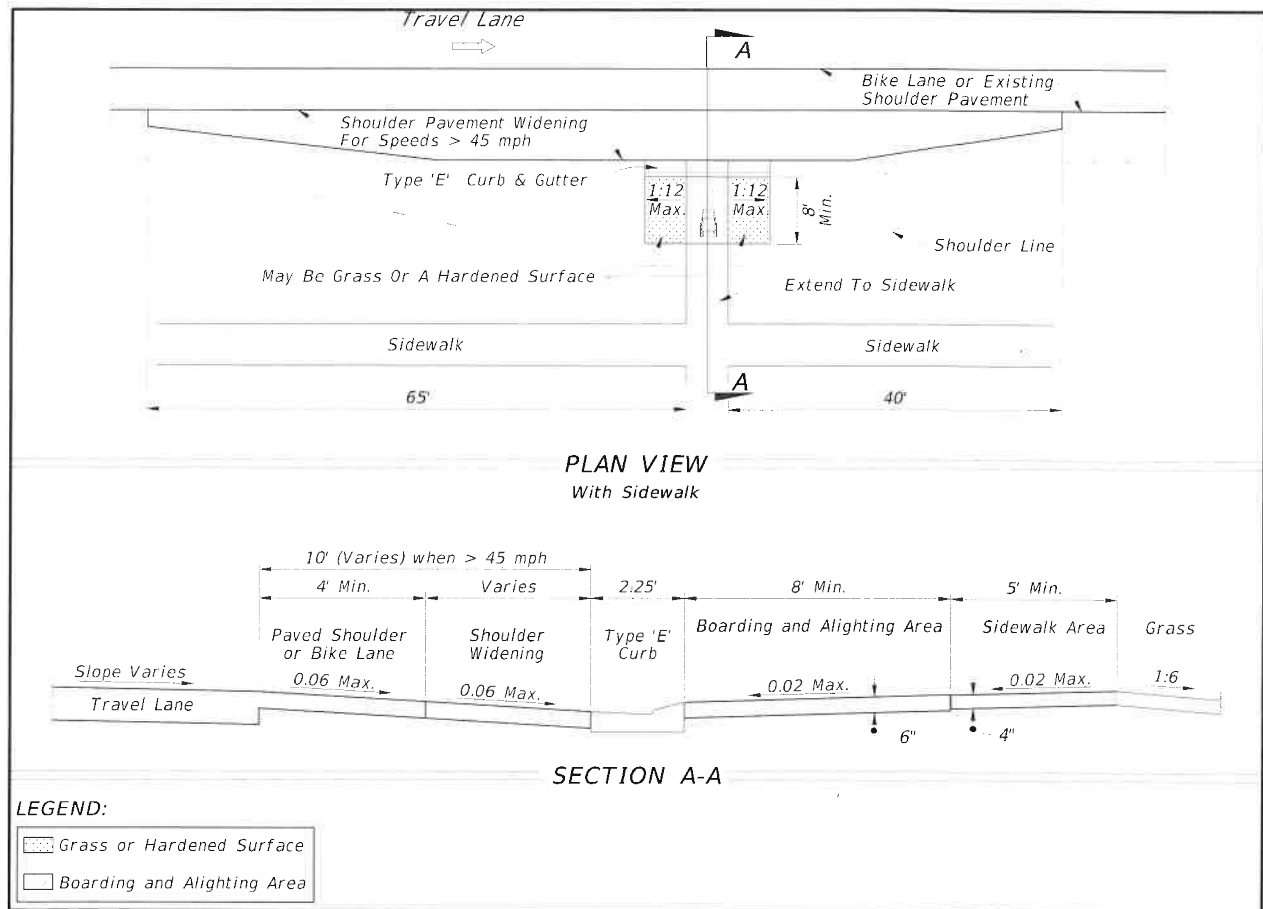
2 Boarding and Alighting Area for Flush Shoulder Roadways with Connection to the Sidewalk
